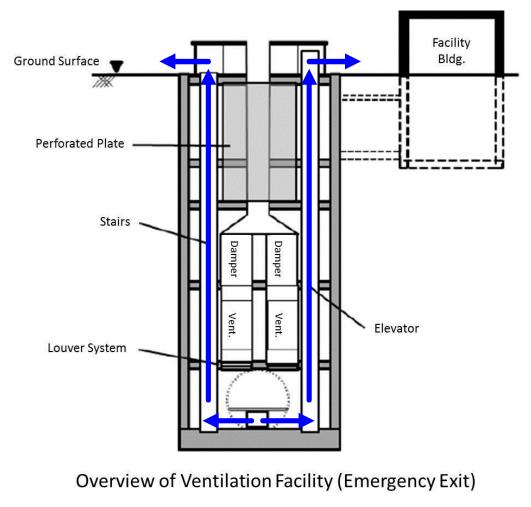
Conceptual Typical Section of SCMAGLEV Emergency Egress at Vent Plants
